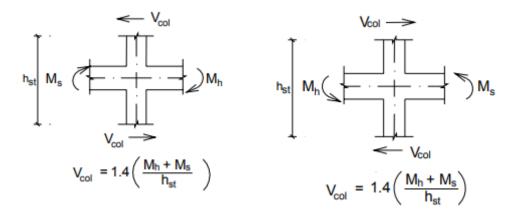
Column with sway to left and right (source: Explanatory Examples for Ductile Detailing of RC Buildings IITK-GSDMA_EQ22-V3.0)
